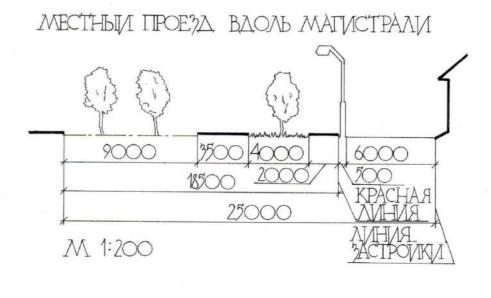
A residential street. An example of single-family houses development. Cross street profile
